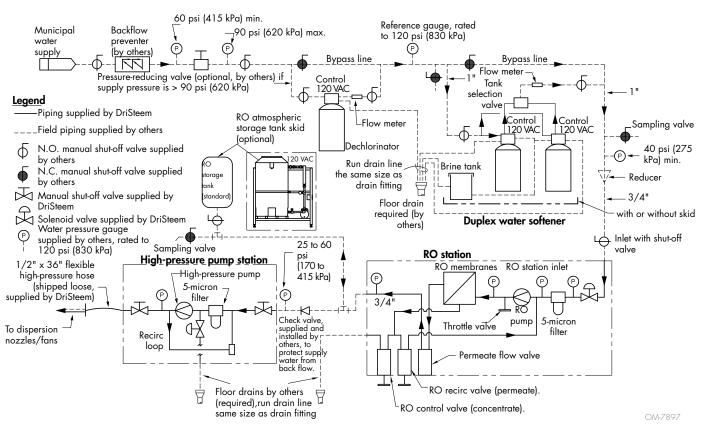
PIPING AND INSTRUMENTATION ARRANGEMENT, MODELS 250 THROUGH 5500
